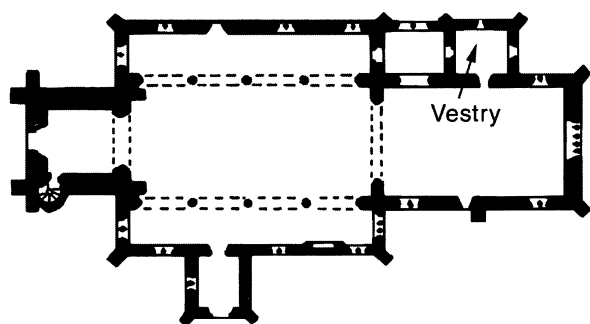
Sible Hedingham, St. Peter, ground plan.
